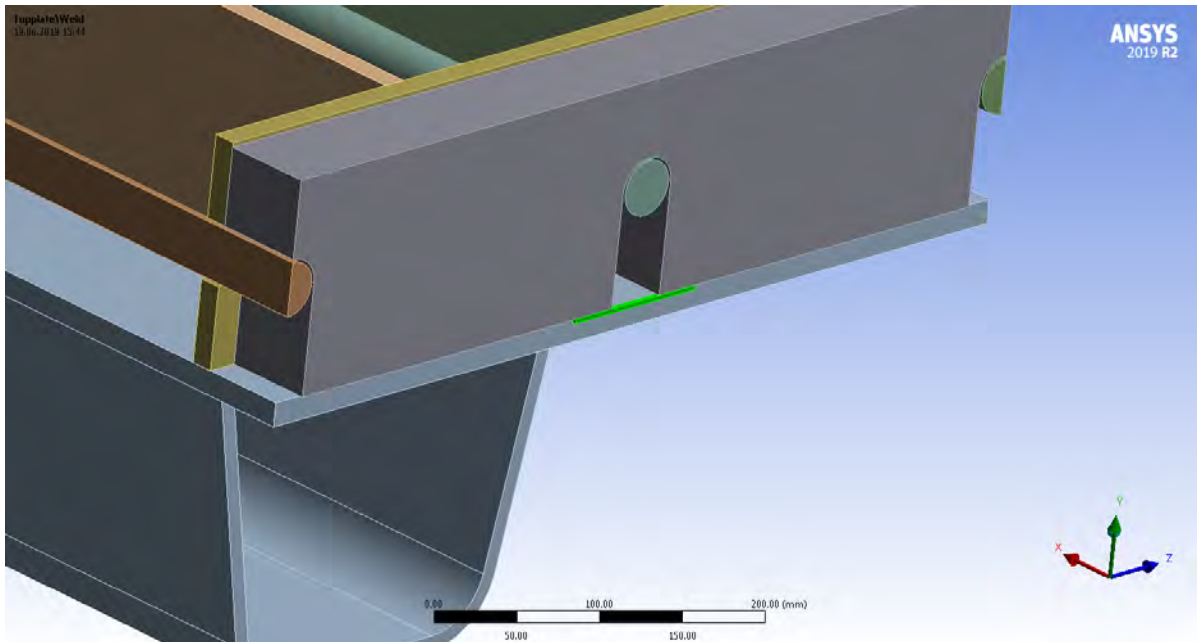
3 mm throat thickness, 100 mm long weld
